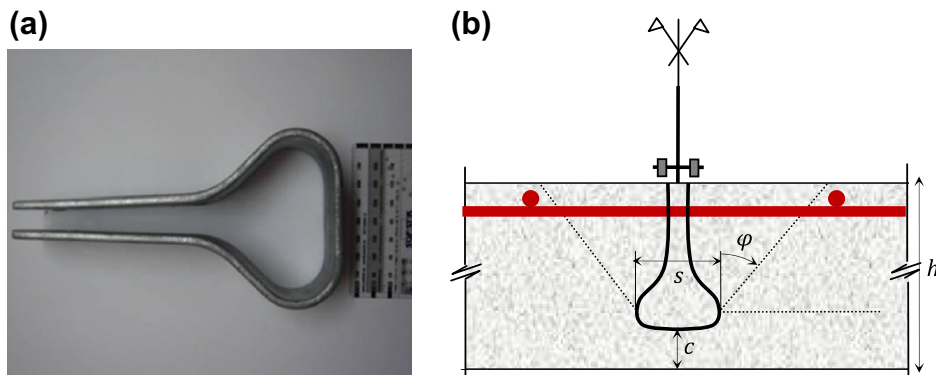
(a) PS anchor analyzed and (b) anchorage failure mechanism.
